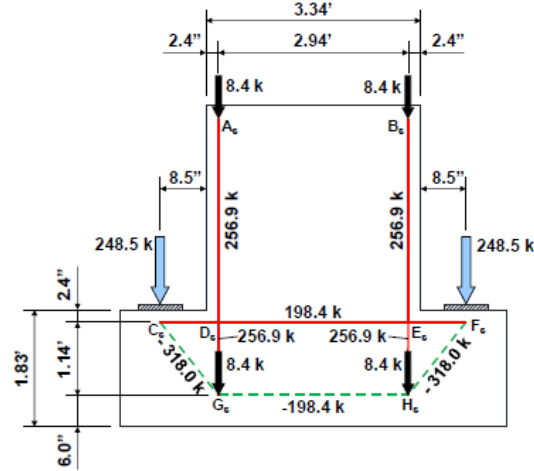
Local strut-and-tie model for moment frame design (FHWA/TX-12/5-5253-01-1)
